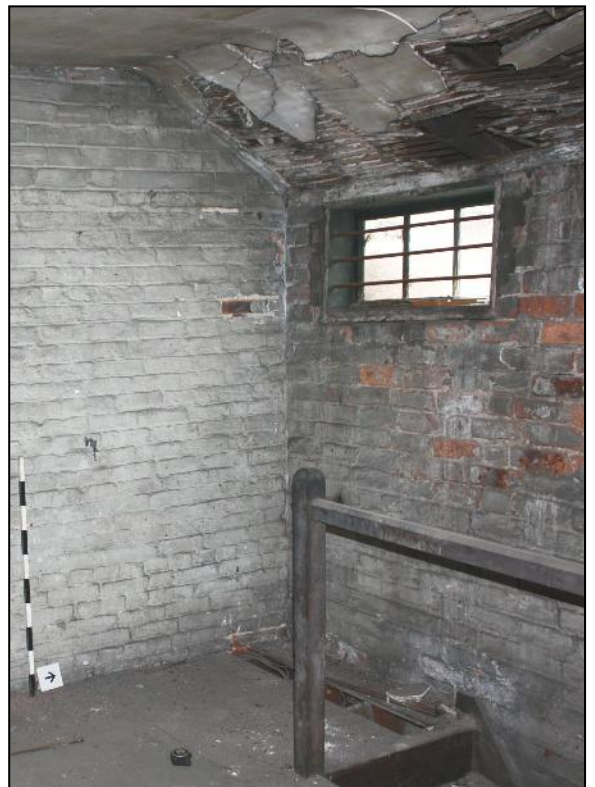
North-east corner of unit B, upper level, showing high window positioned where several roofs meet on outside.
